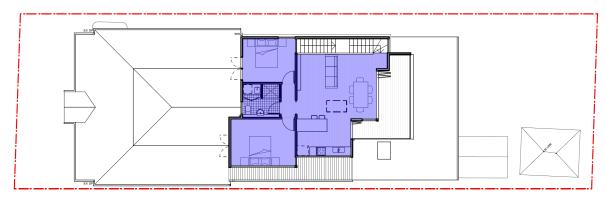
Applicant's gross floor area calculation of the proposed first floor secondary dwelling.
